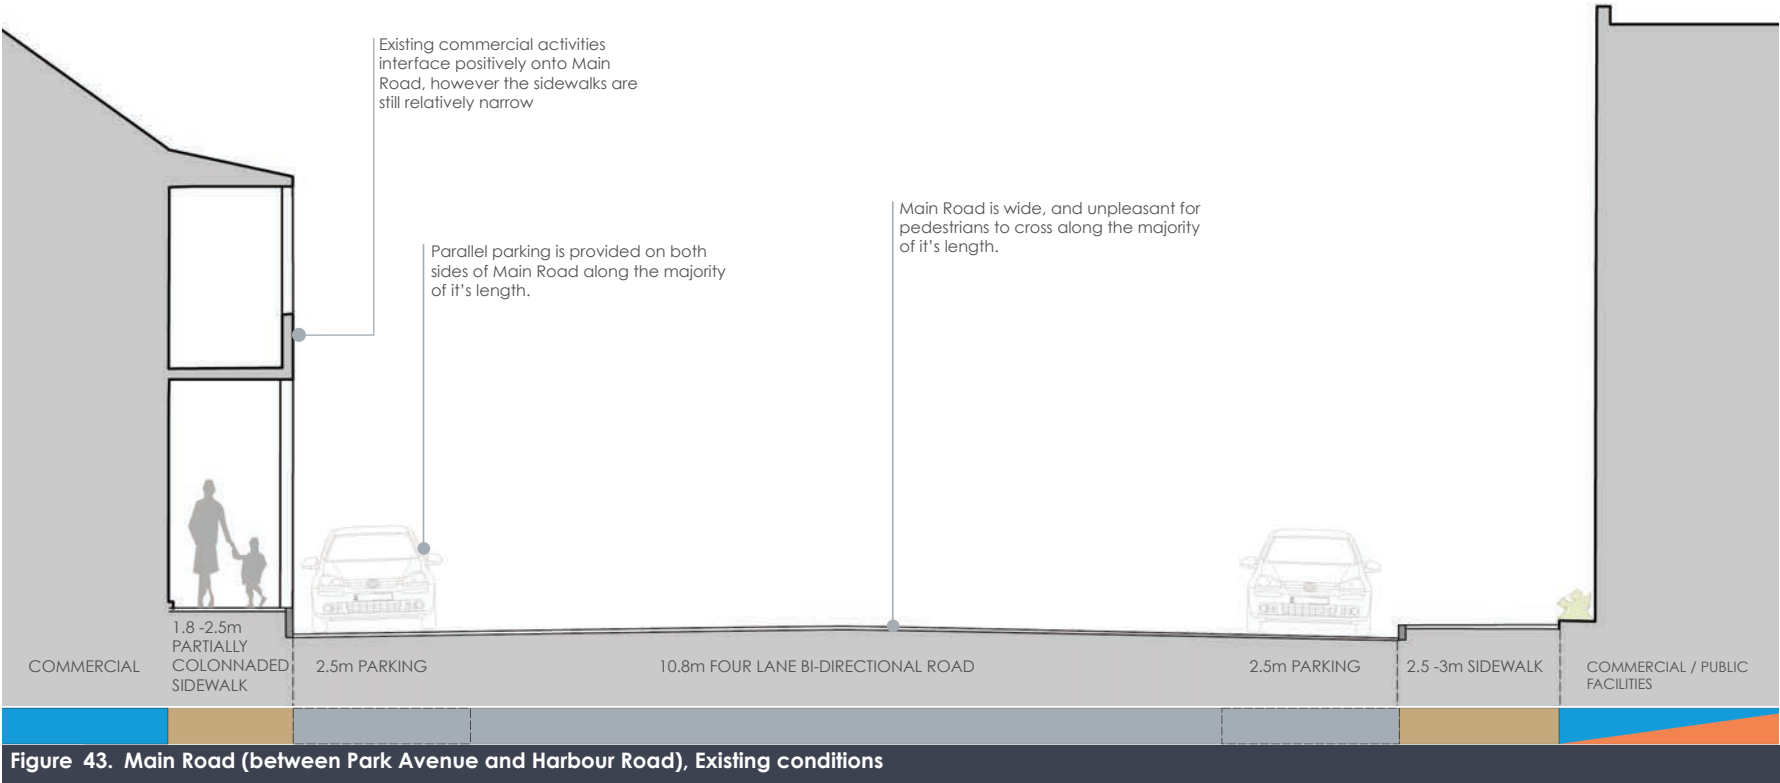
Main Road (between Park Avenue and Harbour Road), Existing conditions
